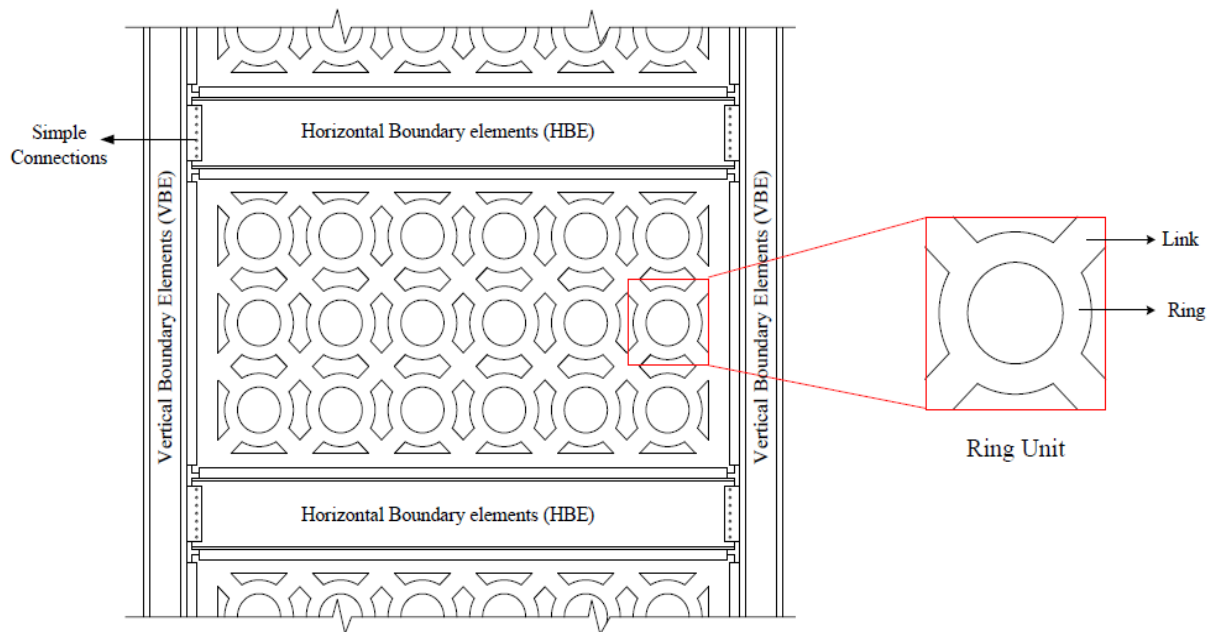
Steel plate shear wall with ring cut-outs and a basic ring unit
